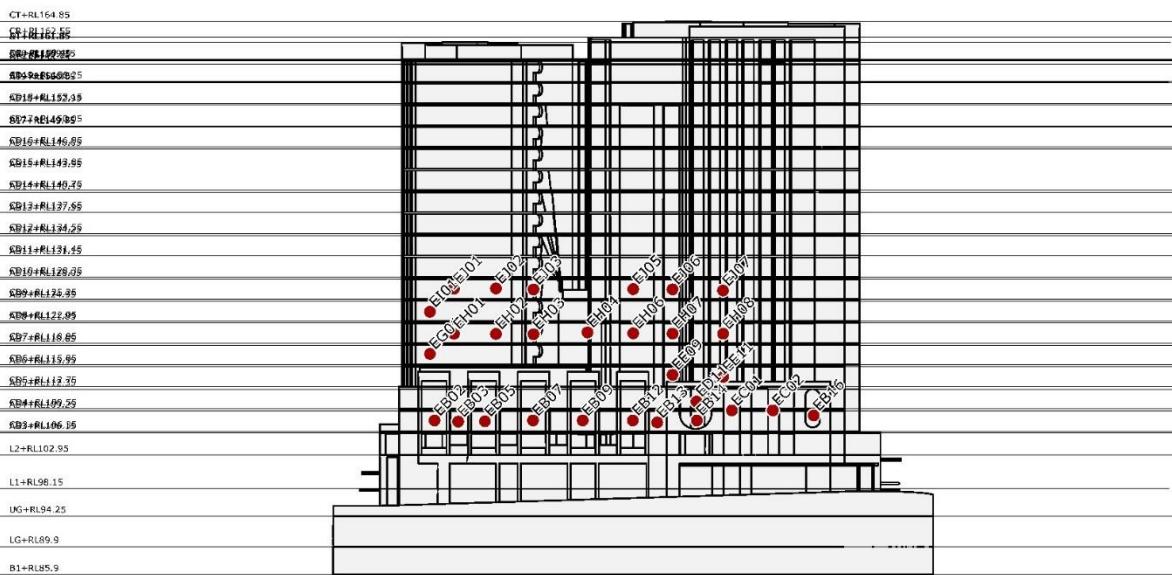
Layout of Pressure Sensors – East Elevation
